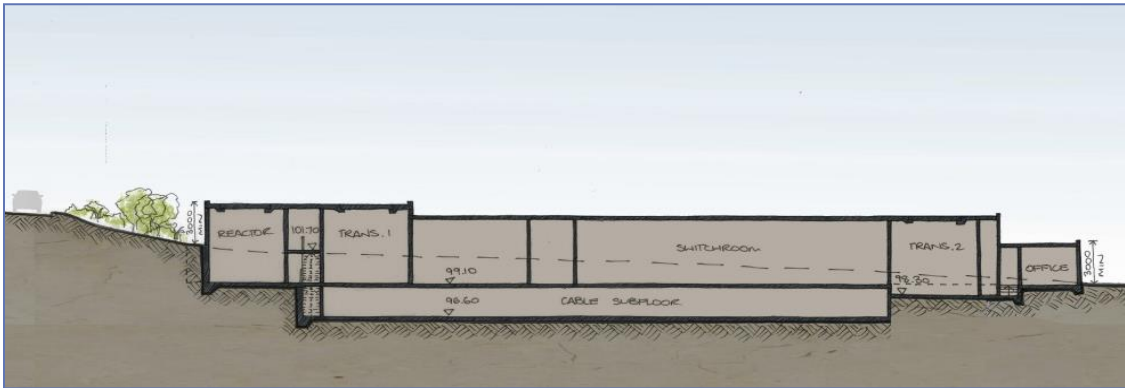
Indicative elevation of the proposed Lindfield South substation.
